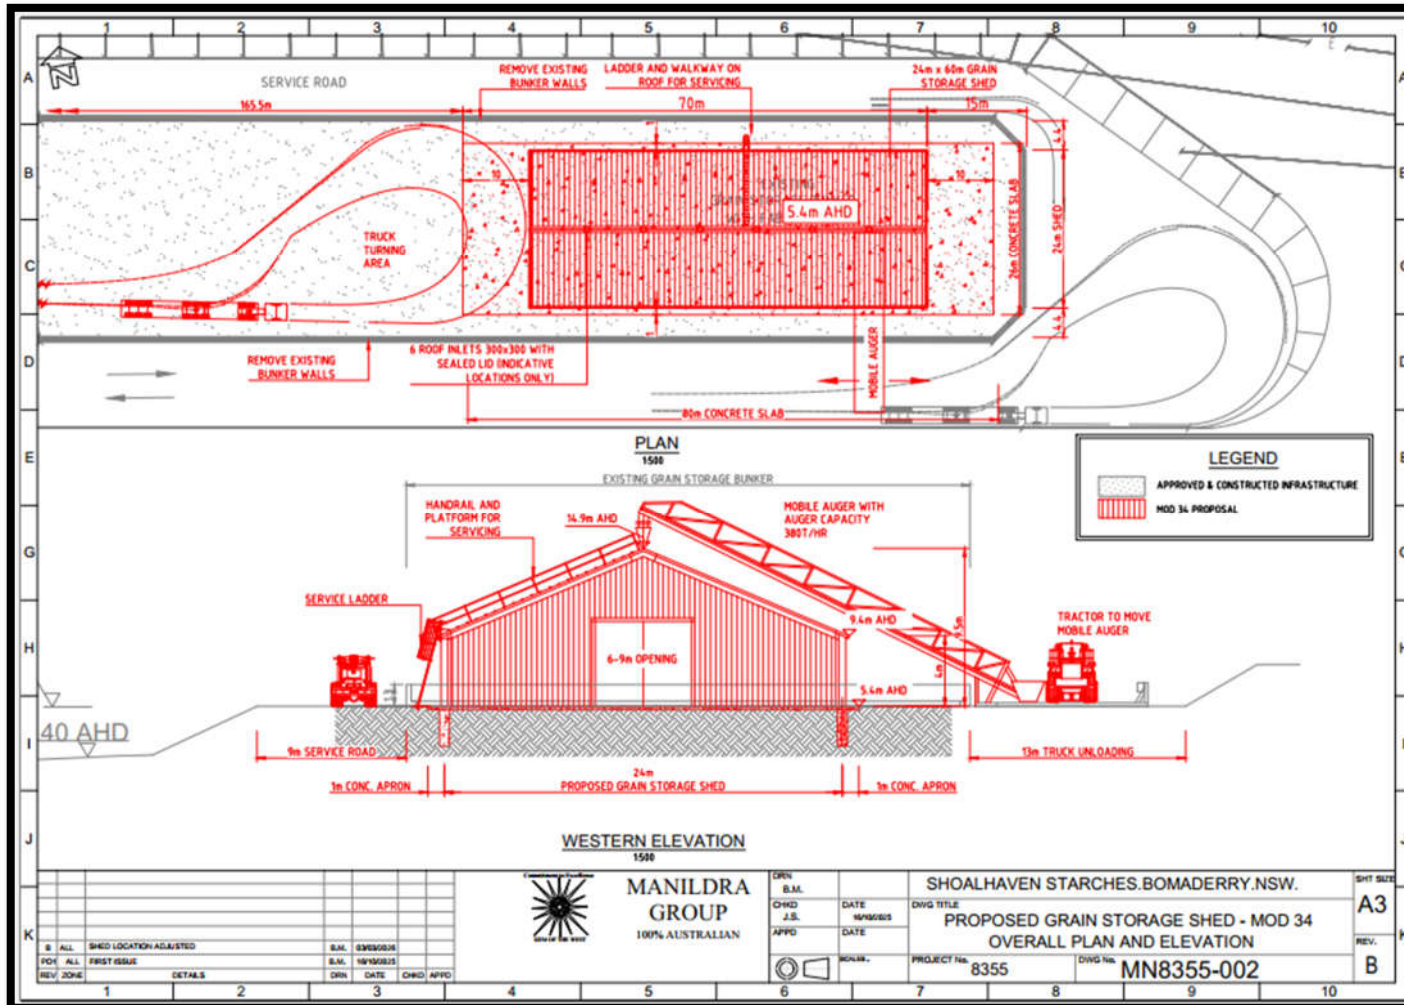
Plan and elevations of Proposed Emergency Grain Storage Shed (Source: Shoalhaven Starches)
